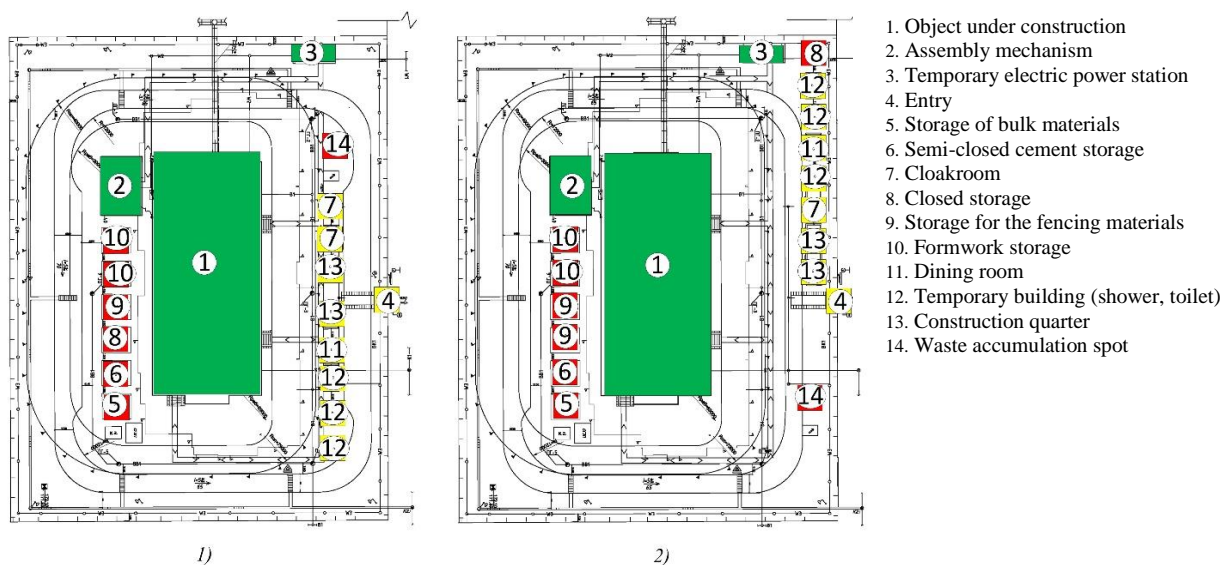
Construction site layout: 1 — initial plan; 2 — optimized plan
